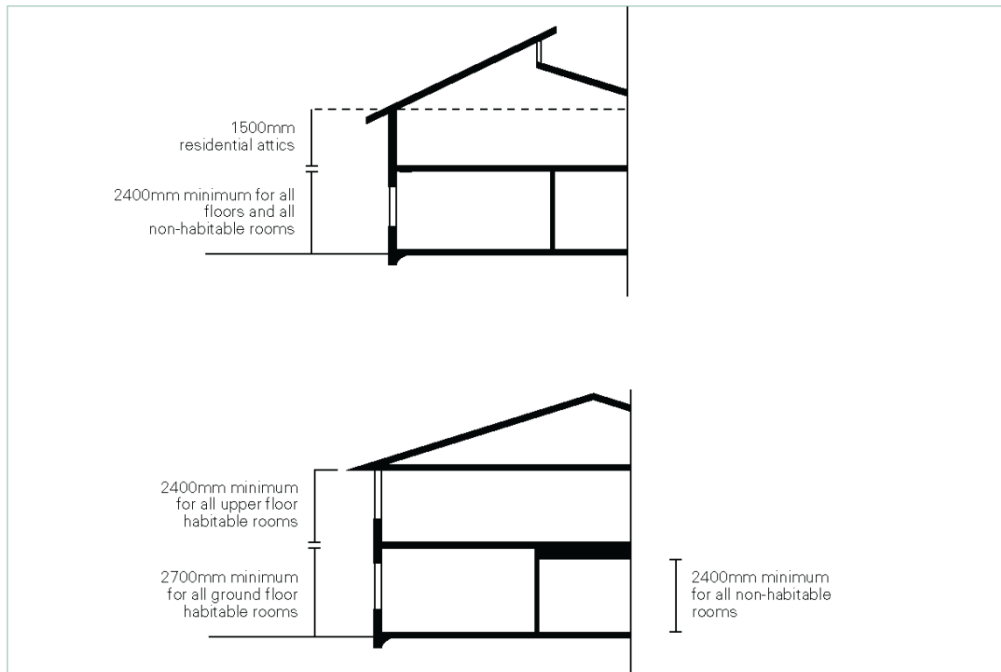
FLOOR TO CEILING HEIGHTS
